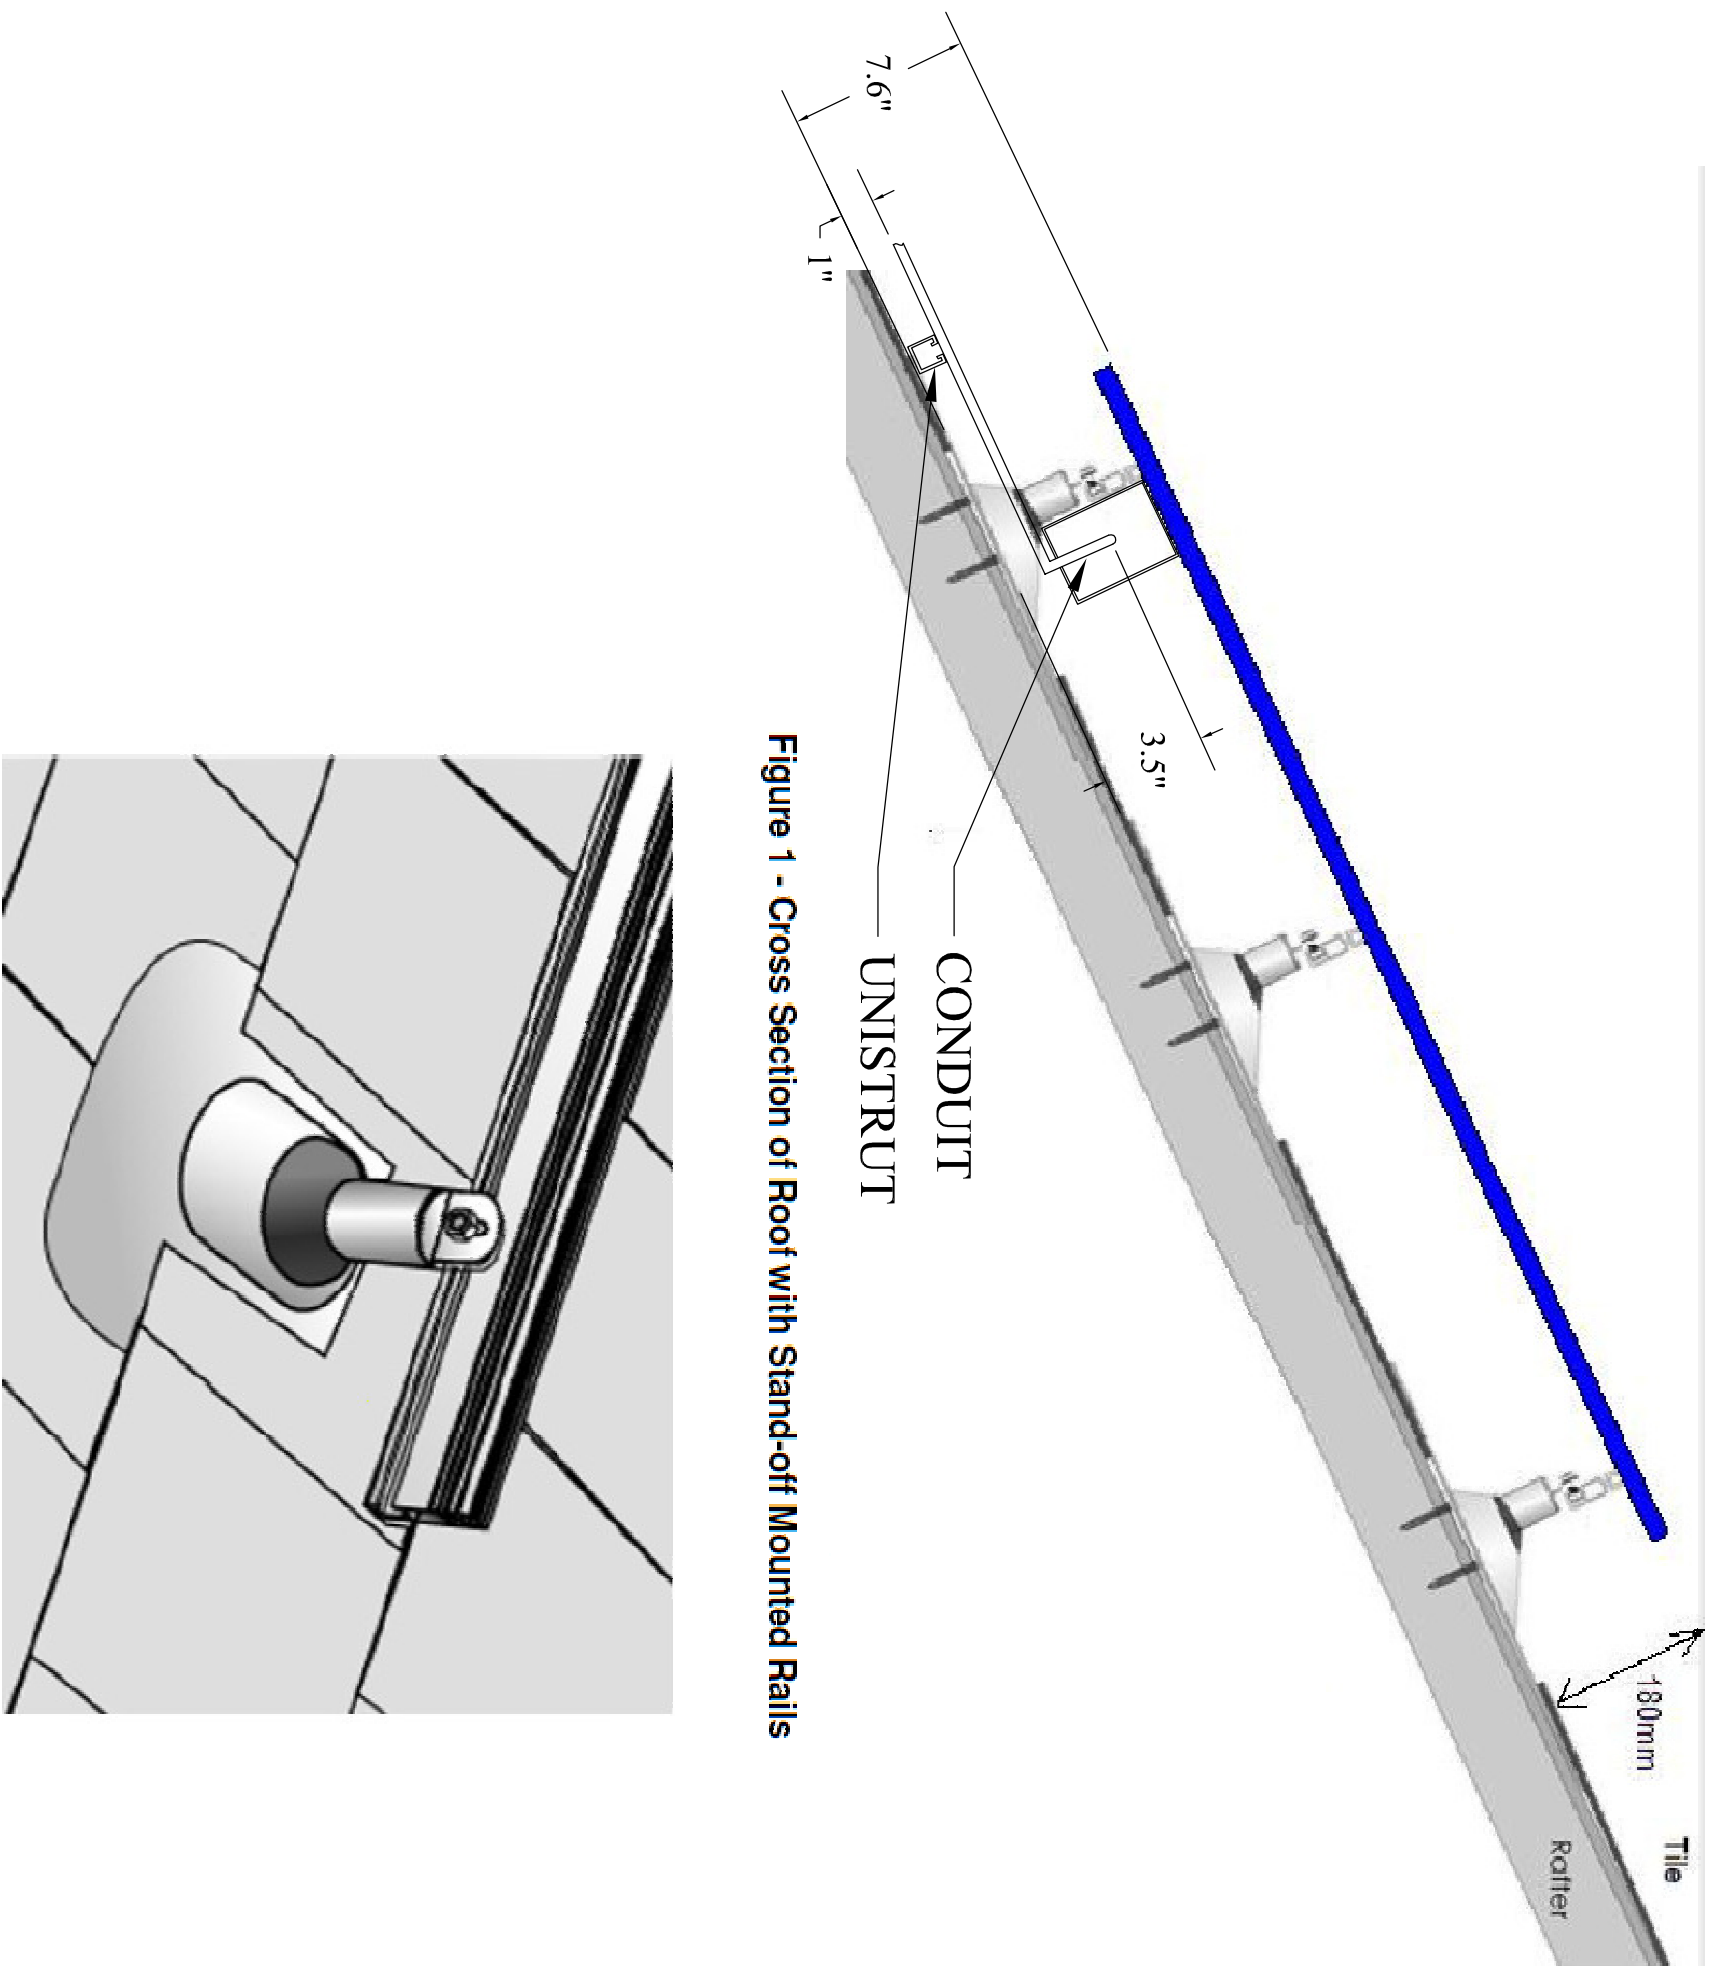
Cross Section of Roof with Stand-off Mounted Rails
